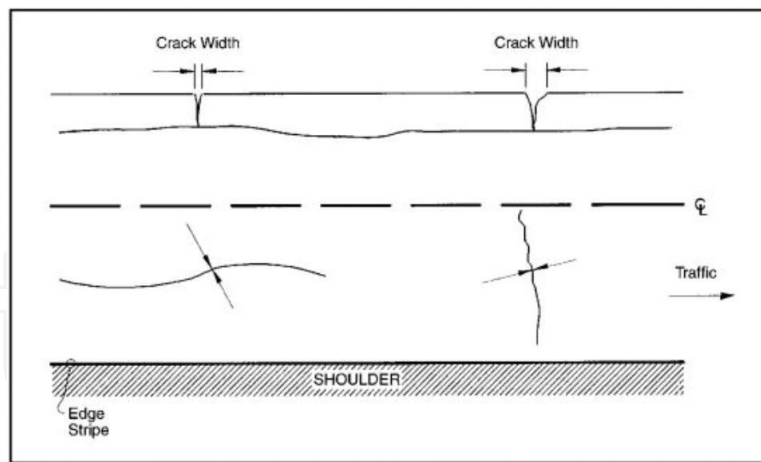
All levels of fatigue failure of asphalt concrete pavement for the highway according to the Guide [13].
